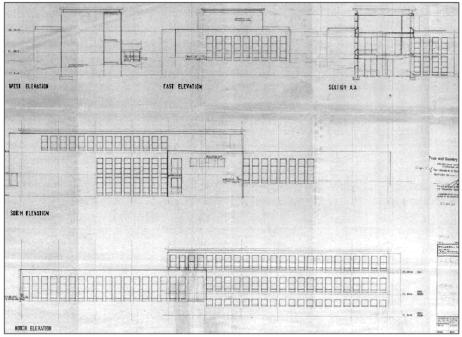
The Administration Building elevations, Mockridge Stahle & Mitchell, 1971. Source: ARRB.
